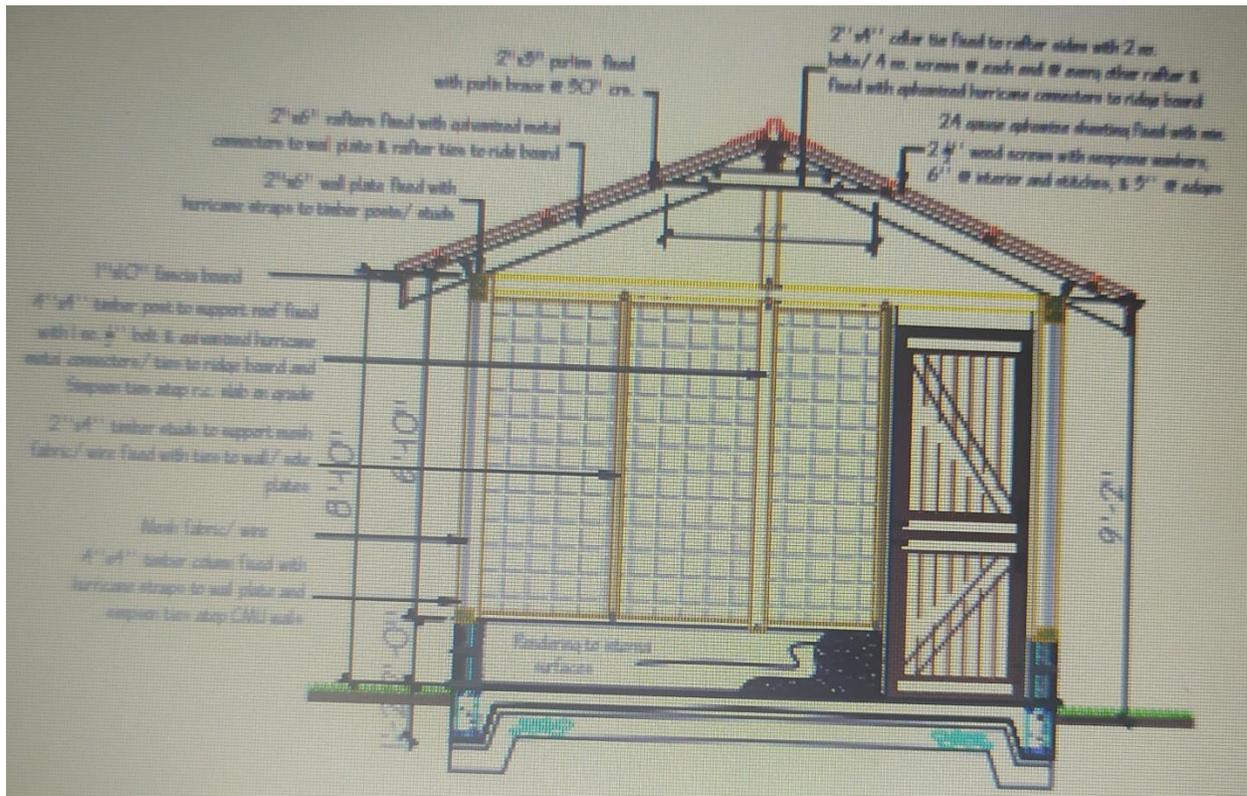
Rabbit structure for renovation, by replacing galvanize sheeting on the sides with 3 rows of 6” blocks
